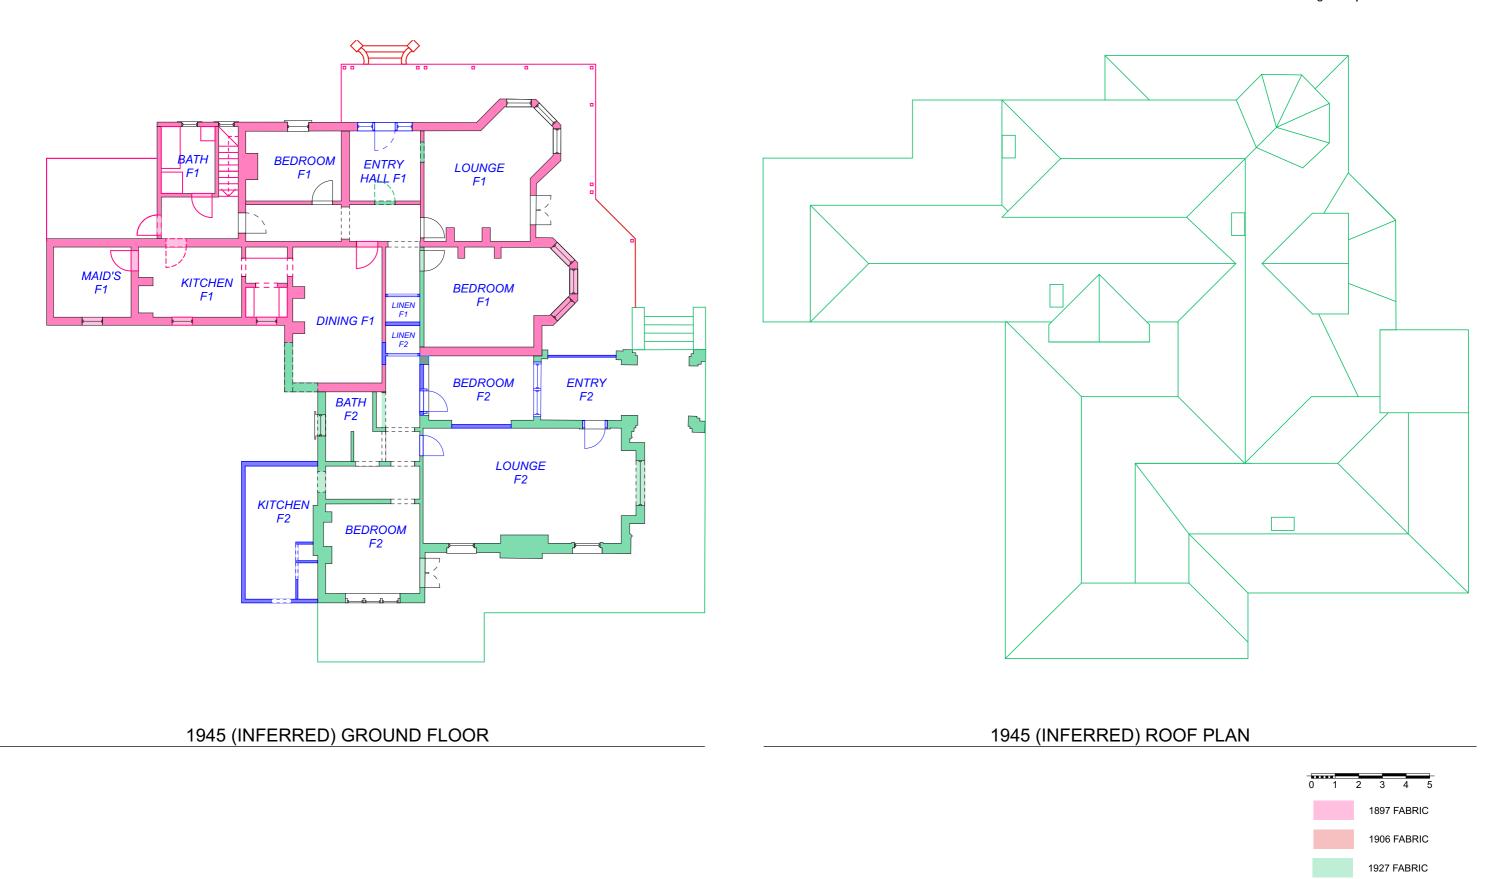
52 The Esplanade, 1945, Floor and Roof Plans. (Source: Palassis Architects 2023)
